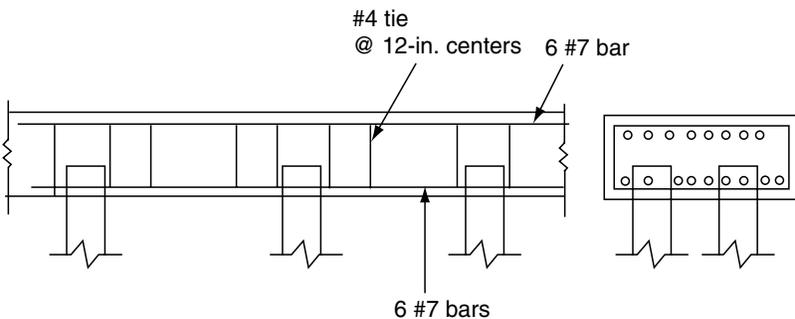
Reinforcement details for grade beam (Example 5.7).
